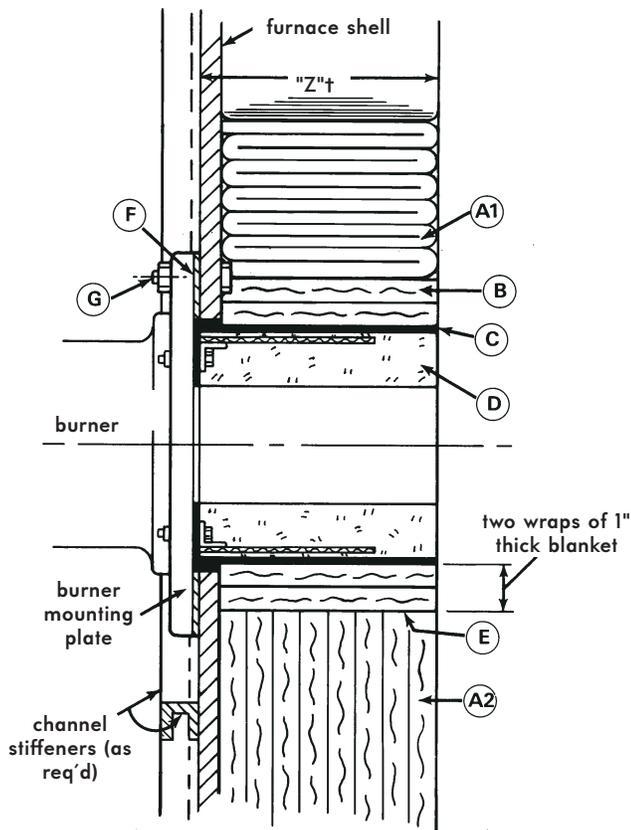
Cross section through a fiber-lined vertical furnace wall showing a recommended method for installing a burner tile. Letters refer to legend below and to text.
